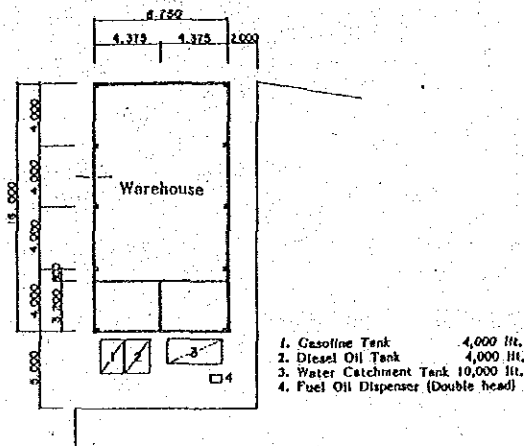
Water Catchment and Fuel Tanks Layout
